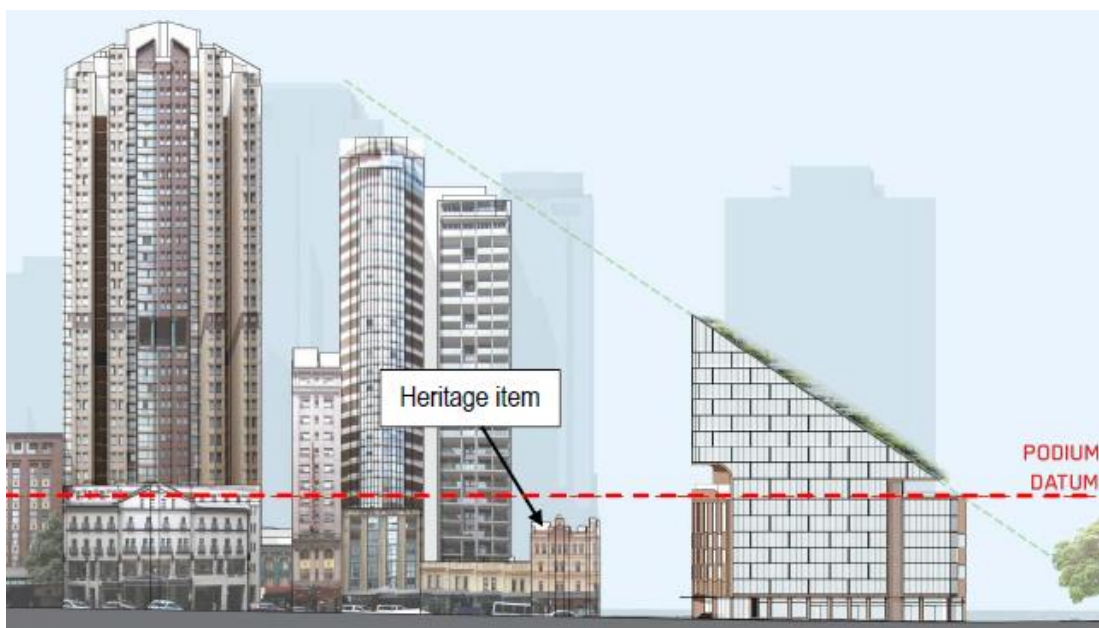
Podium datum (west elevation) in relation to surrounding development along Pitt St
